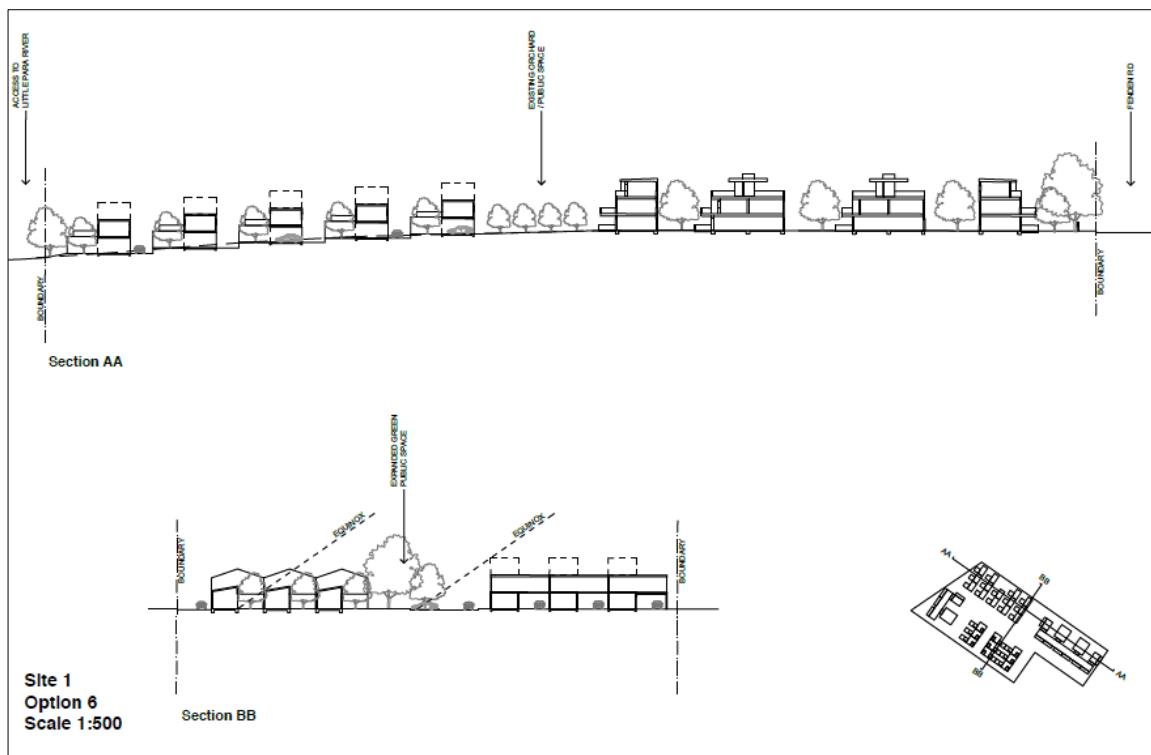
Cross-section of Site 1 in WS infill (RWS1)
